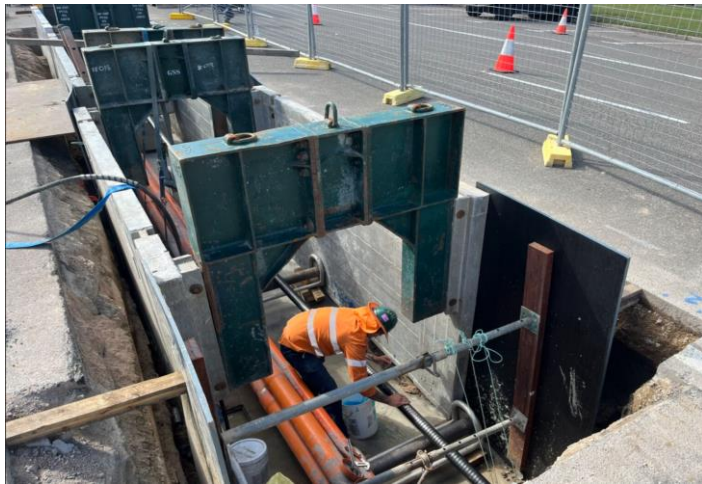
The new cables connecting Belgian Gardens and Garbutt substations are lubricated and carefully installed into the conduit.
